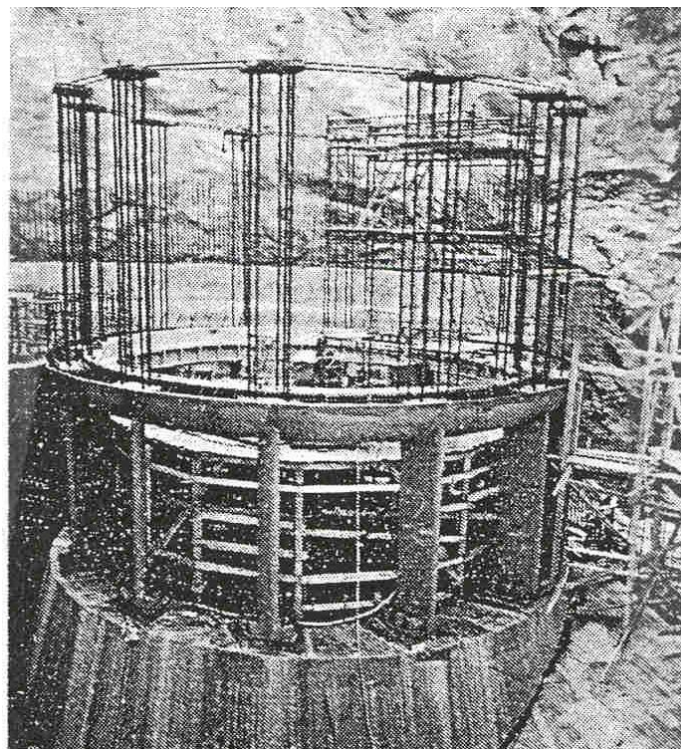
Concrete spiral casing and stay ring with anchoring bars.
